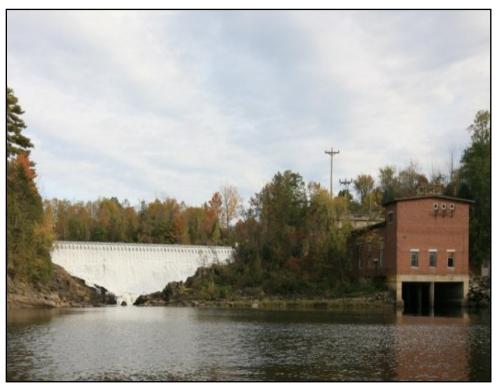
Huntington Falls Dam, Powerhouse-1 and Tailrace
